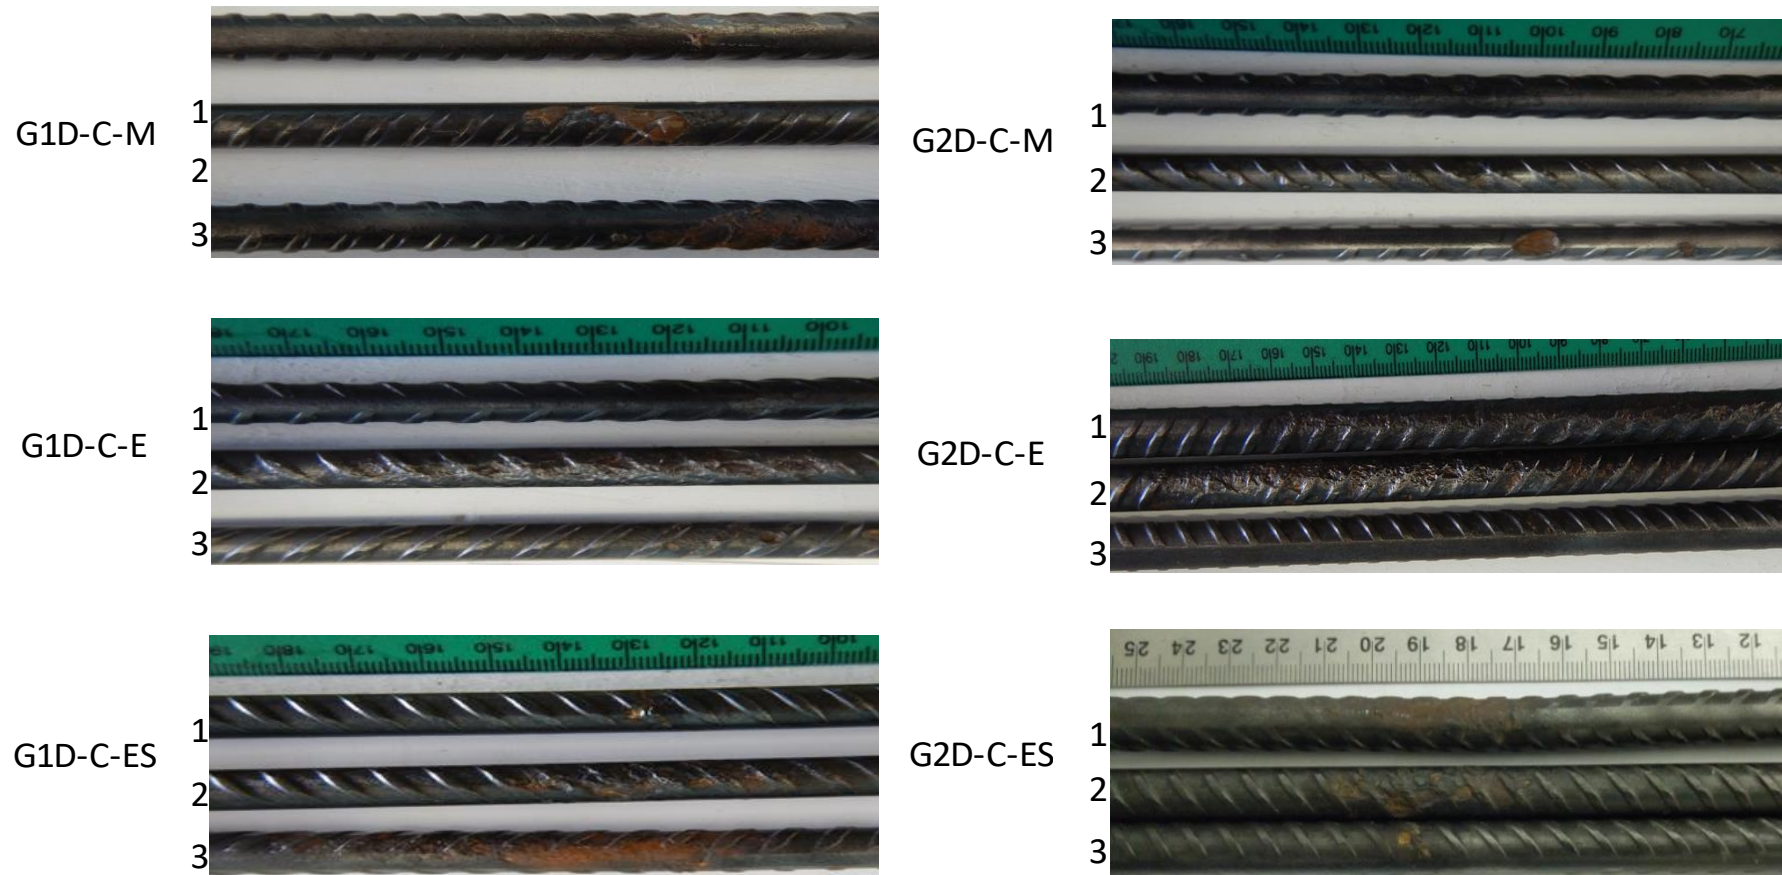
Photographs of corroded reinforcement bars from cracked PC/SL concrete specimens
